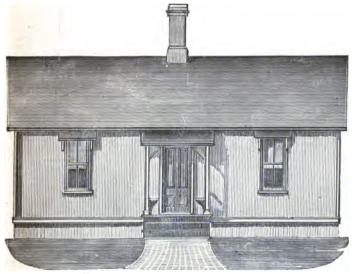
ELEVATION OF ONE-STORY HOUSE.
